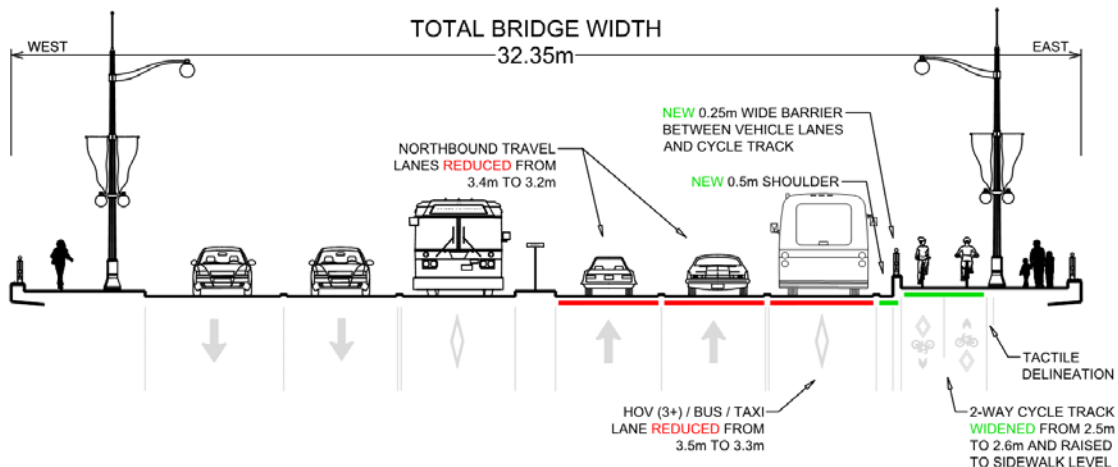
Cross-section of Option 2: bidirectional cycle track widened to 2.6 metres, with an additional 0.25-metre-wide barrier and new 0.5-metre shoulder
